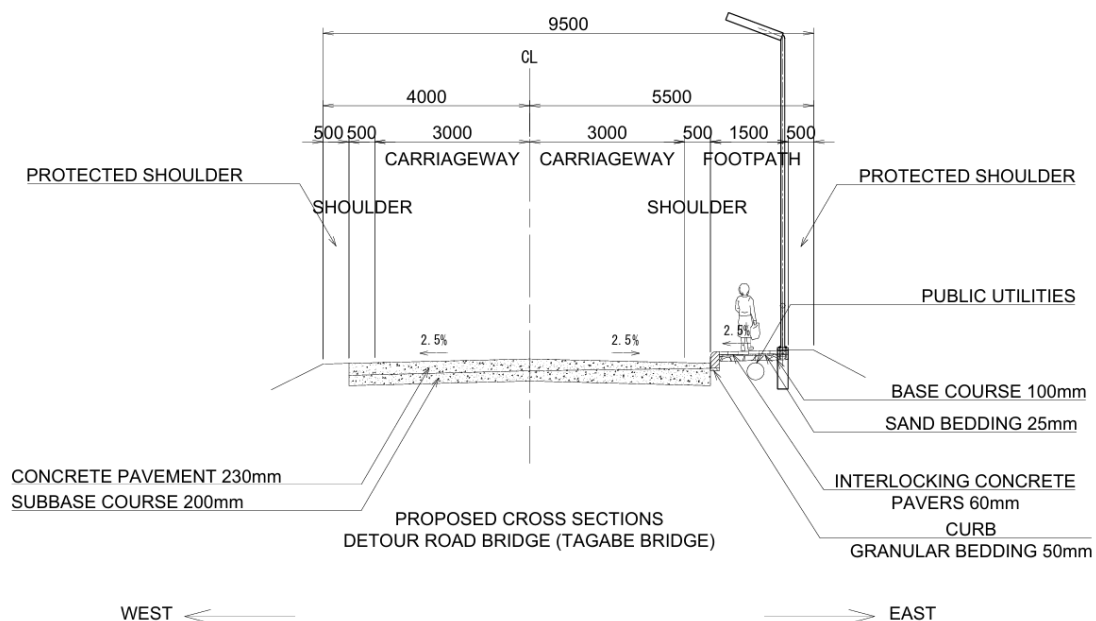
Proposed cross-section of the Detour Road improvement (Smet-Huarere Road).
